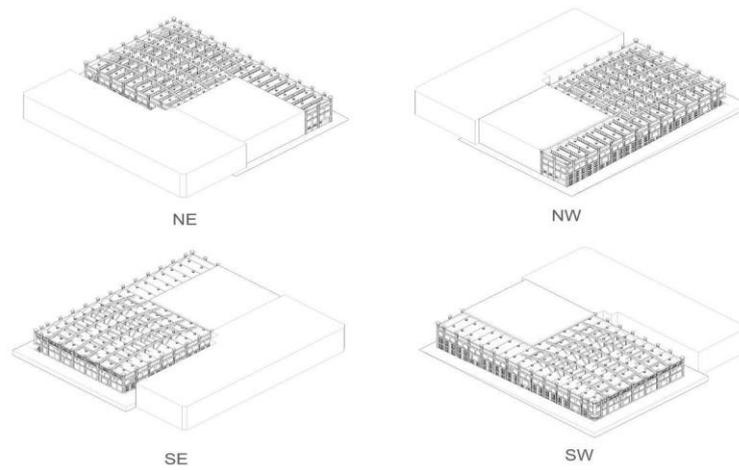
The various isometric views of the Bow Truss building: northeast, northwest, southeast, and southwest.
